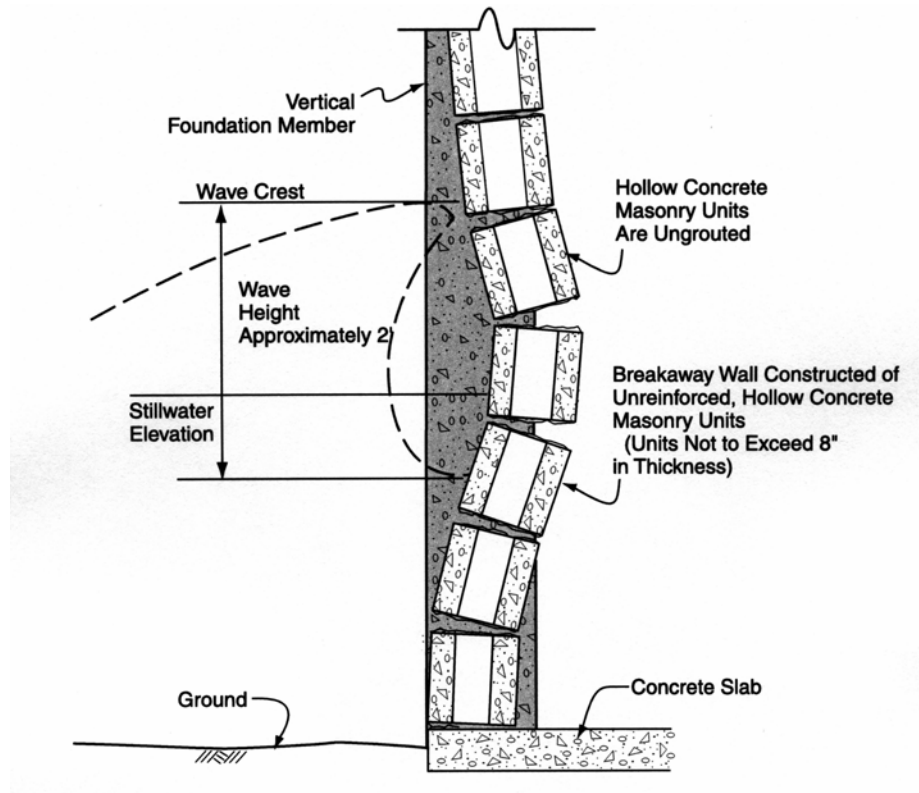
Compressed air trapped between a breaking wave and a vertical wall generates extreme horizontal pressure, often leading to structural failure. Reprinted with permission from the FEMA Technical Bulletin 9-99 (FEMA, 1999).
